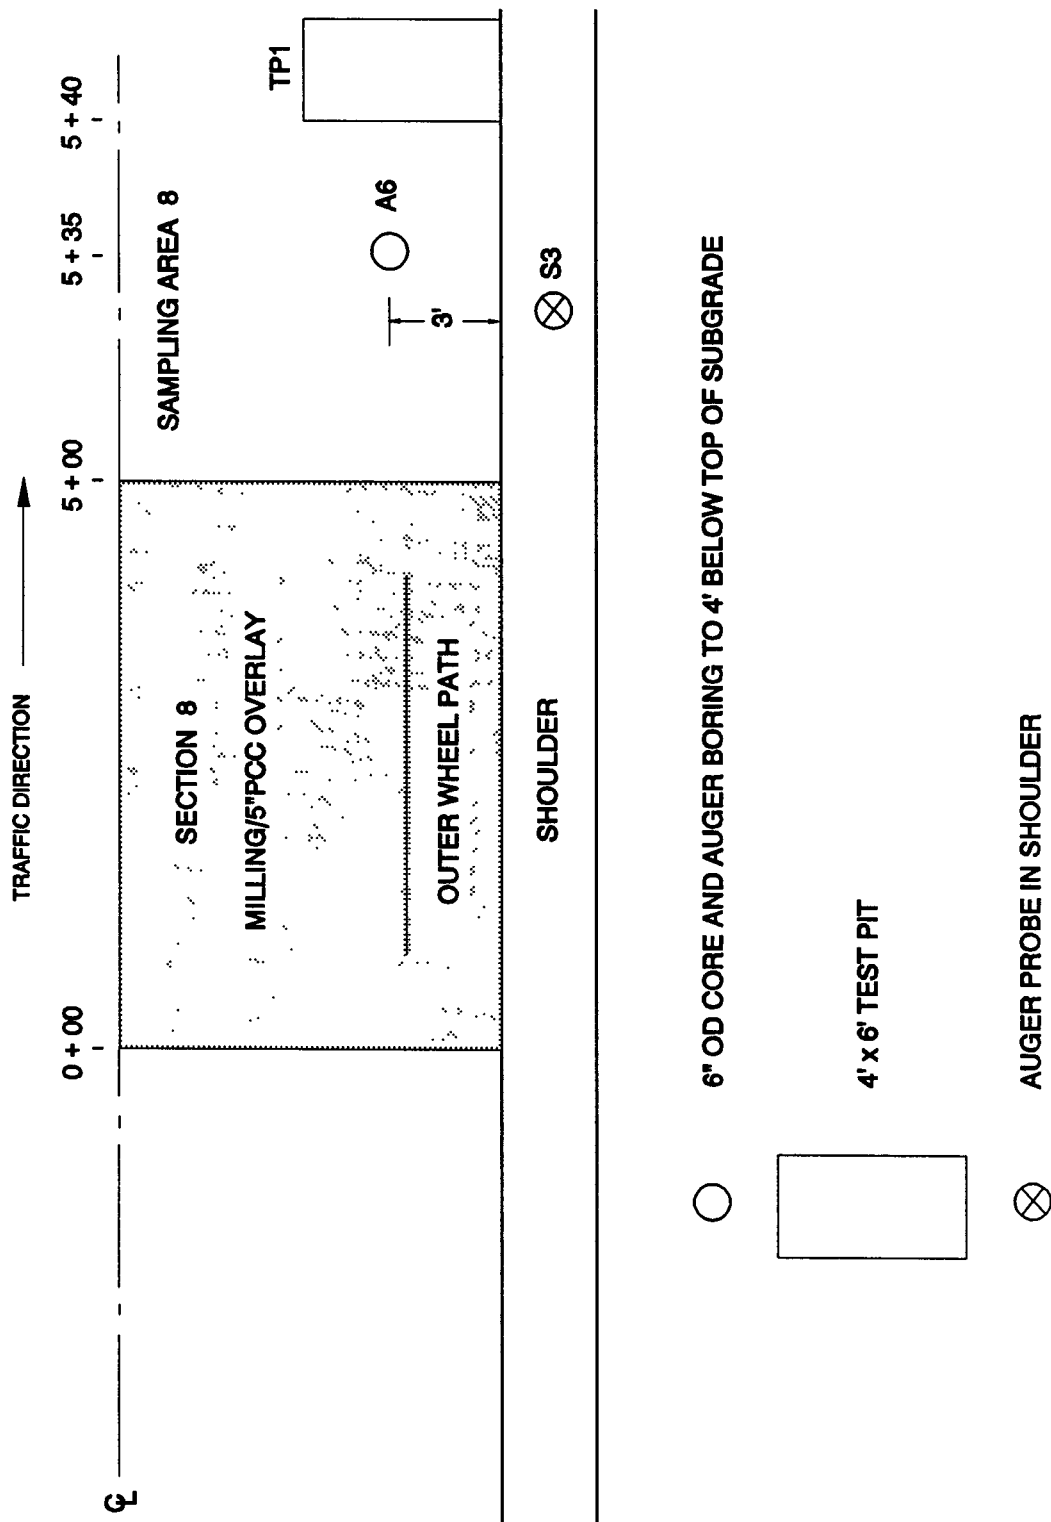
Example of "Pre-Construction" Sampling Plan for Test Section 8
